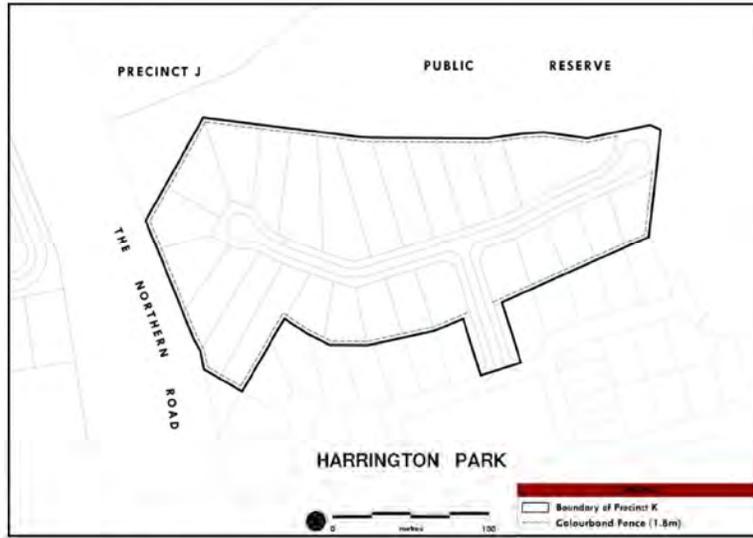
Harrington Grove Precinct K Estate Fencing Plan
